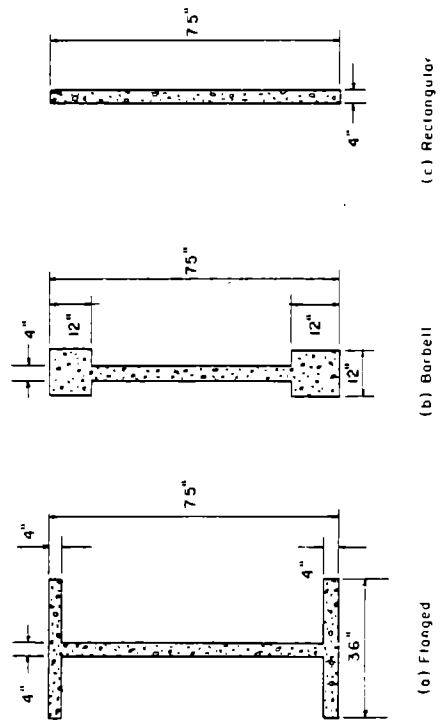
Nominal Cross-Sectional Dimensions of Test Specimens
